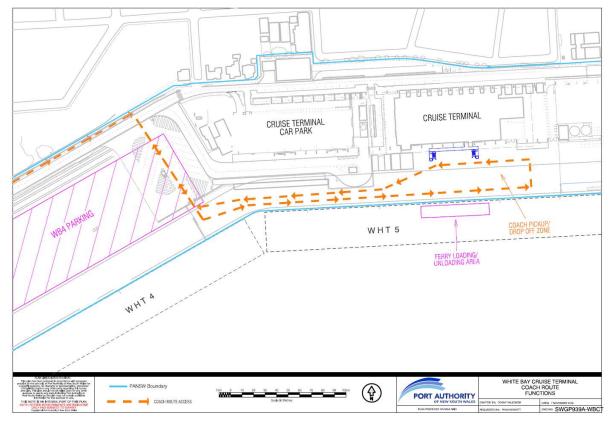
Coach Pickup/Drop off Zone and Ferry Loading/unloading area
